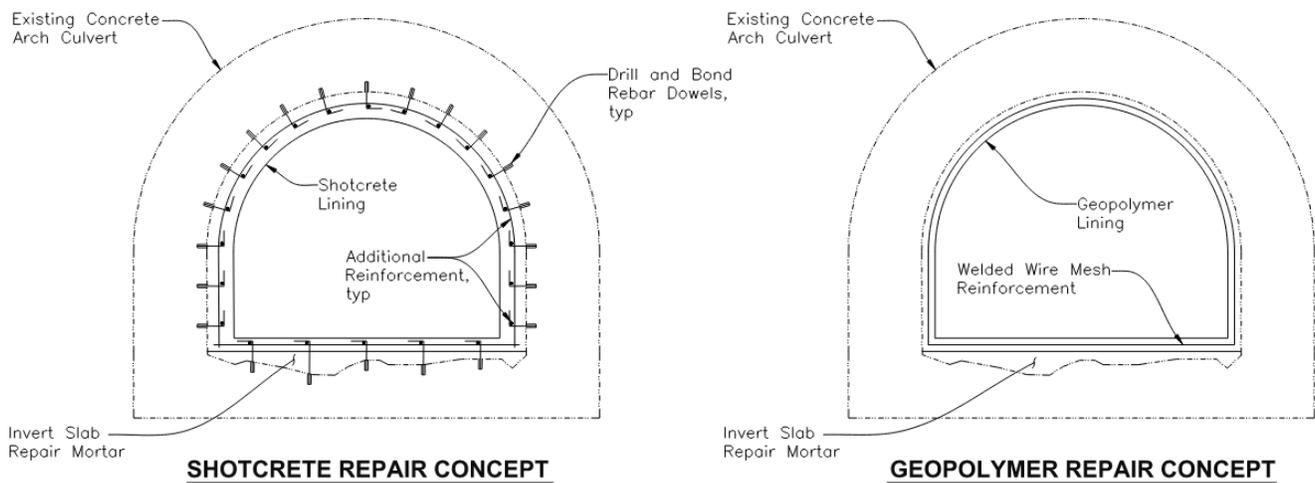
Preliminary Repair Concepts for the Arched Culvert Sections
